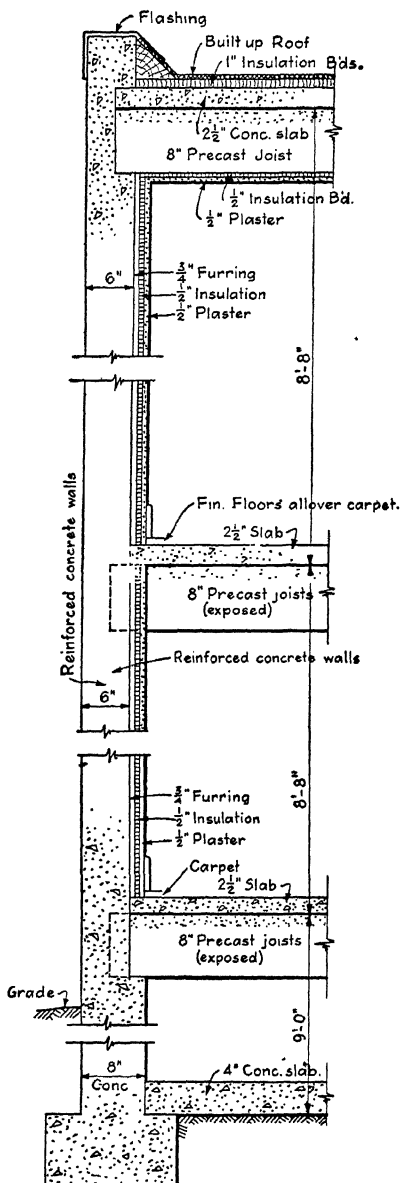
Section of Wall in Concrete House Showing Typical Methods of Insulation
